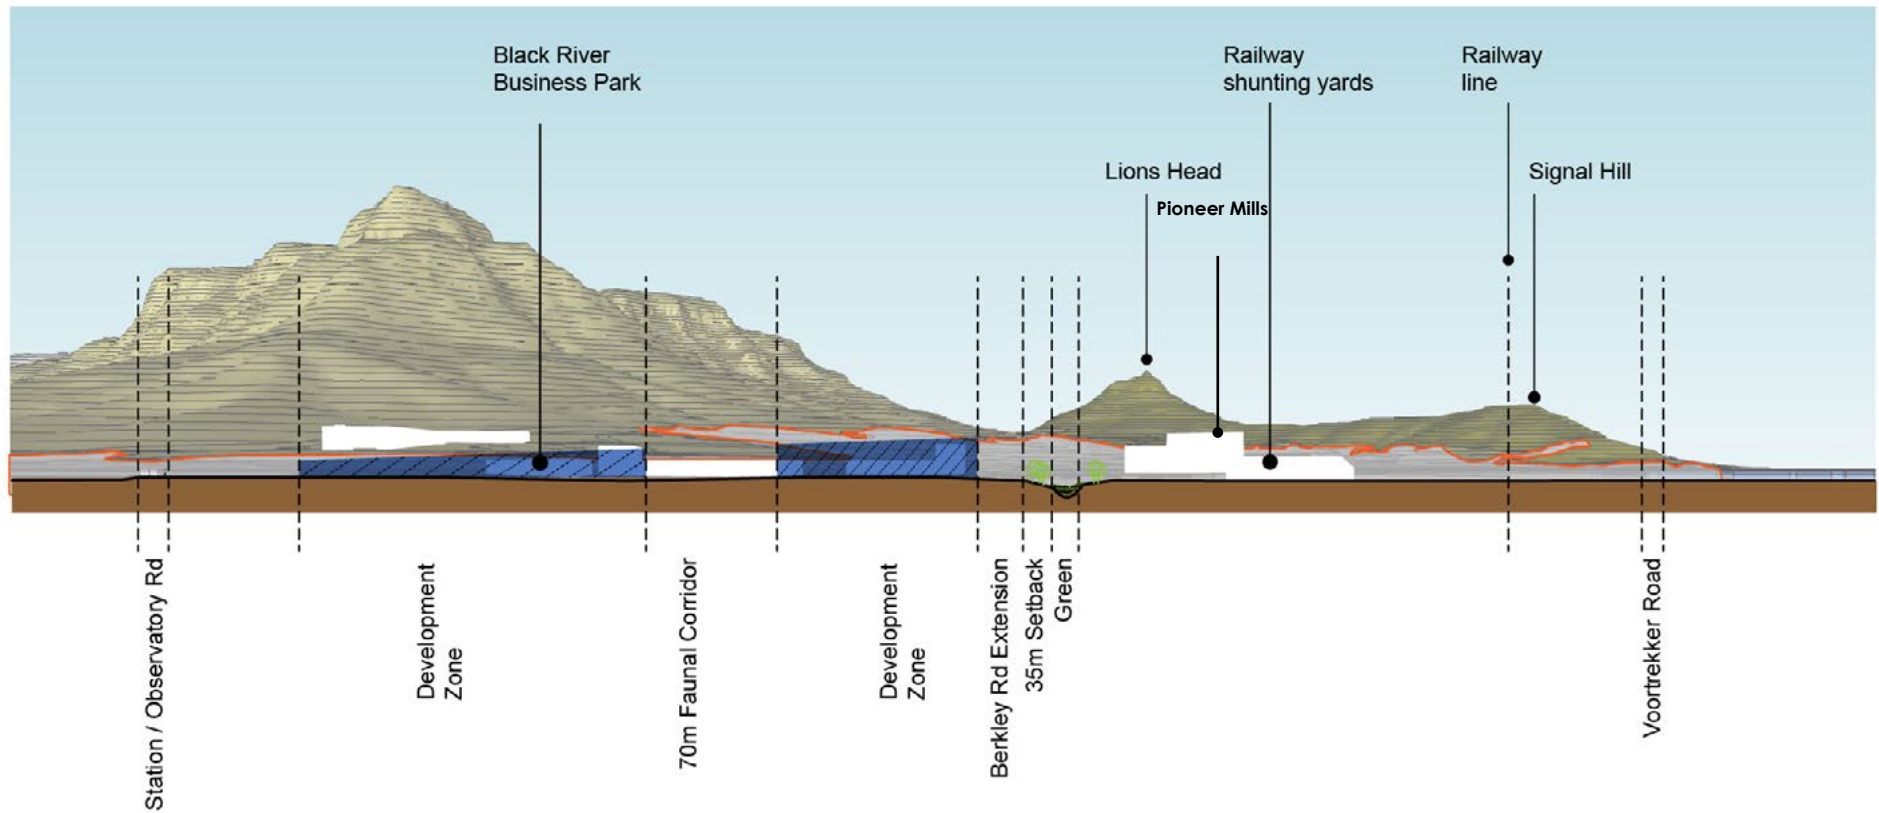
Cross section B through Precinct A from Observatory Road through to Voortrekker Road, showing existing buildings in white and height guidelines in blue hatch.
